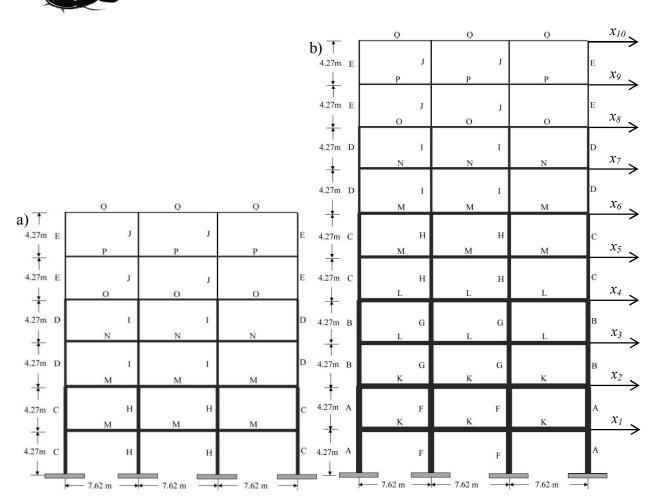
a) 6-Sotey and b) 10-Storey moment resisting steel frame showing sections
